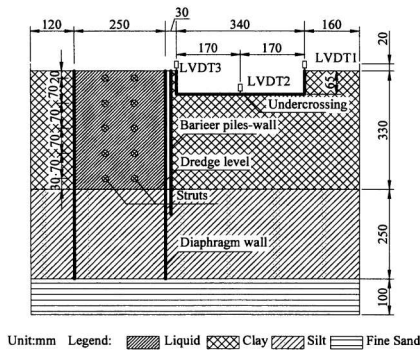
Cross-section 1-1 of model and instrumentation arrangement
